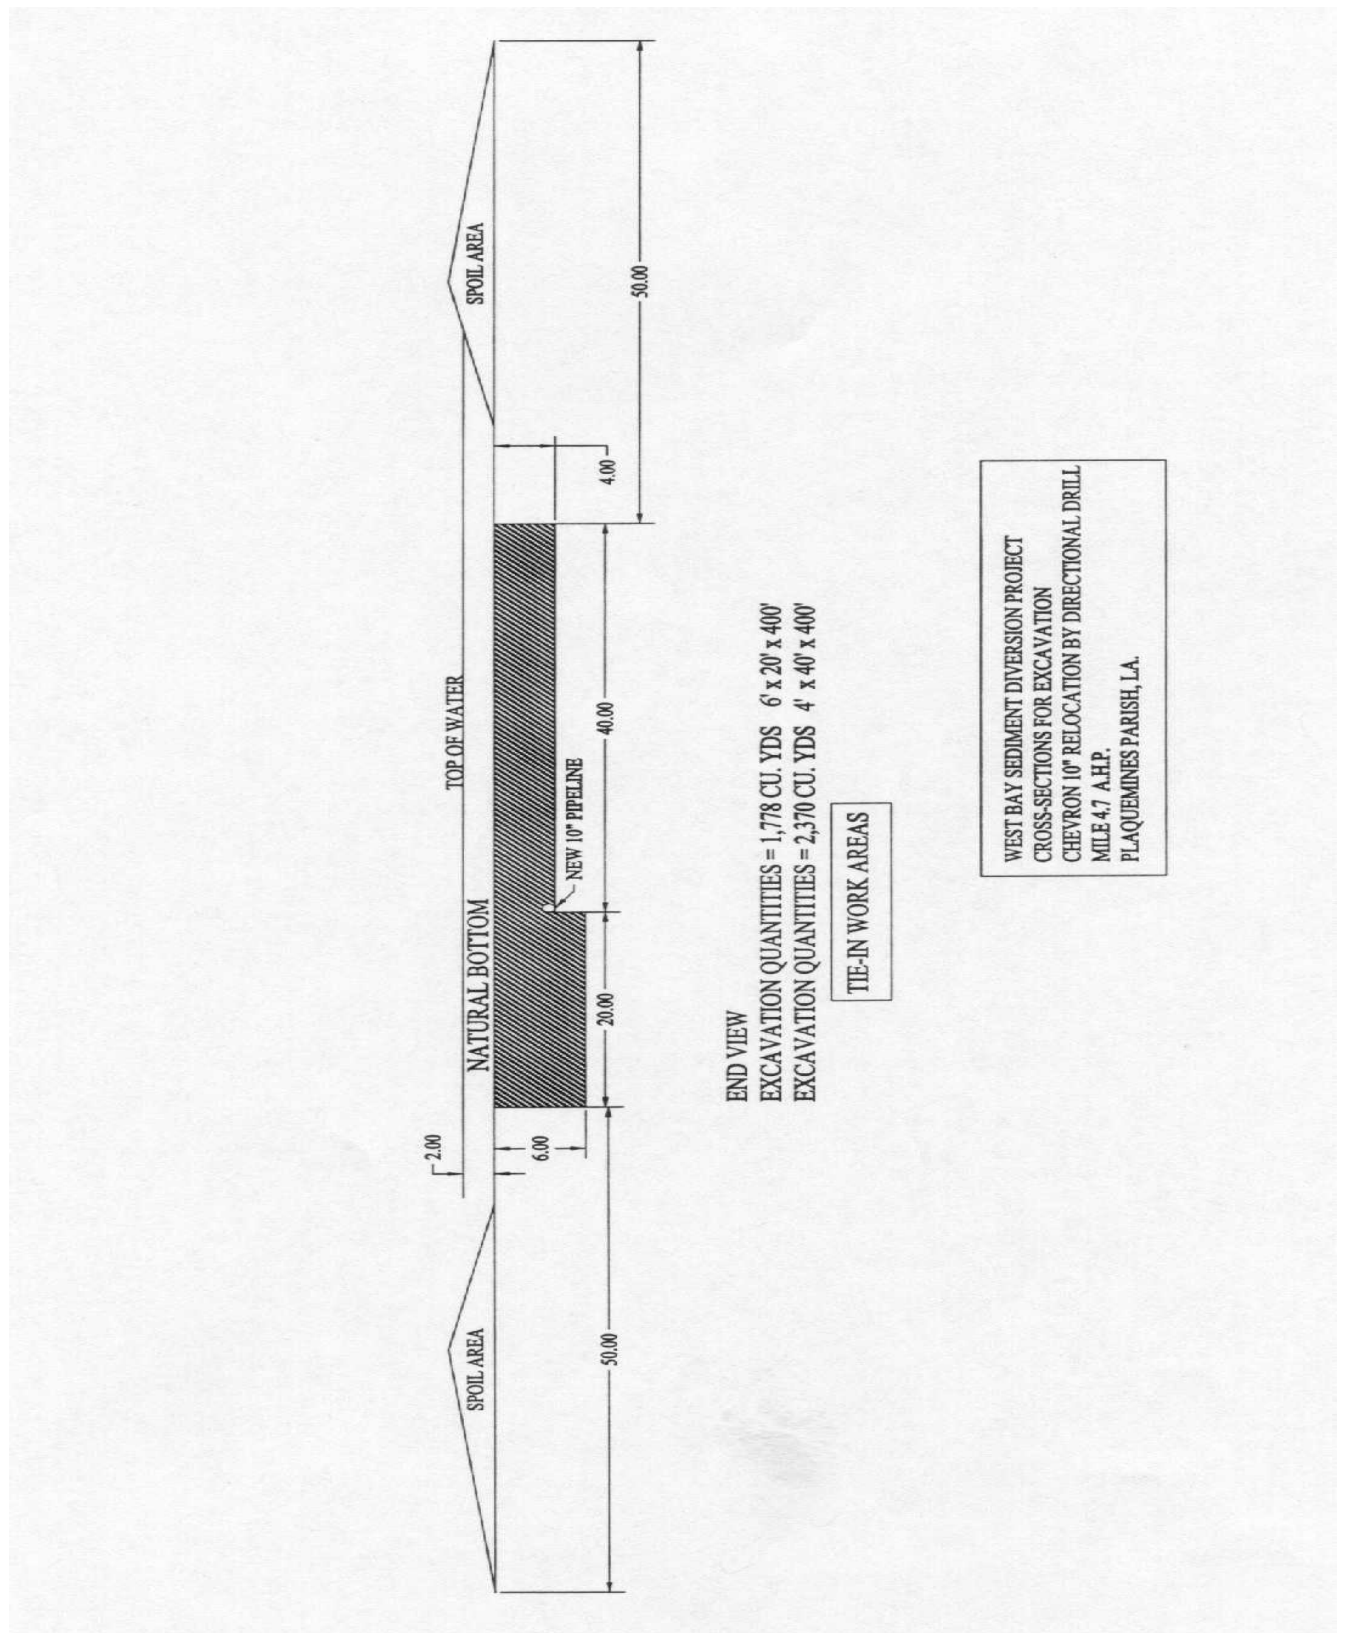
Pipeline Relocation Plans – Temporary or False Ditch.
